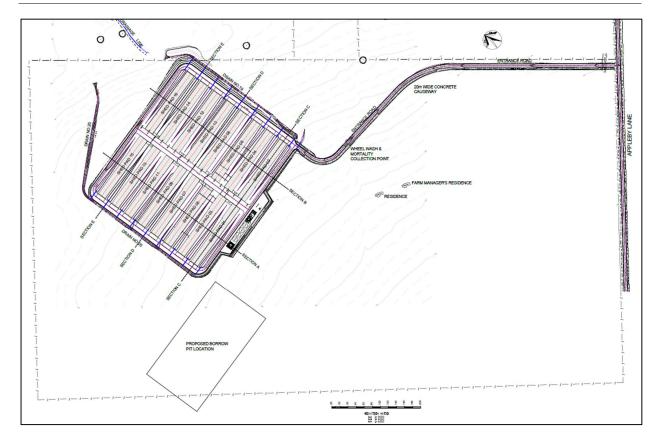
Stormwater Management Plan (Hanlons Consulting, 2024)
